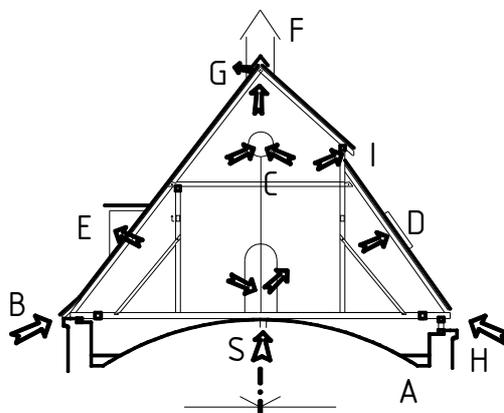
Openings in the under-roof space of a truss that are essential for space air circulation
